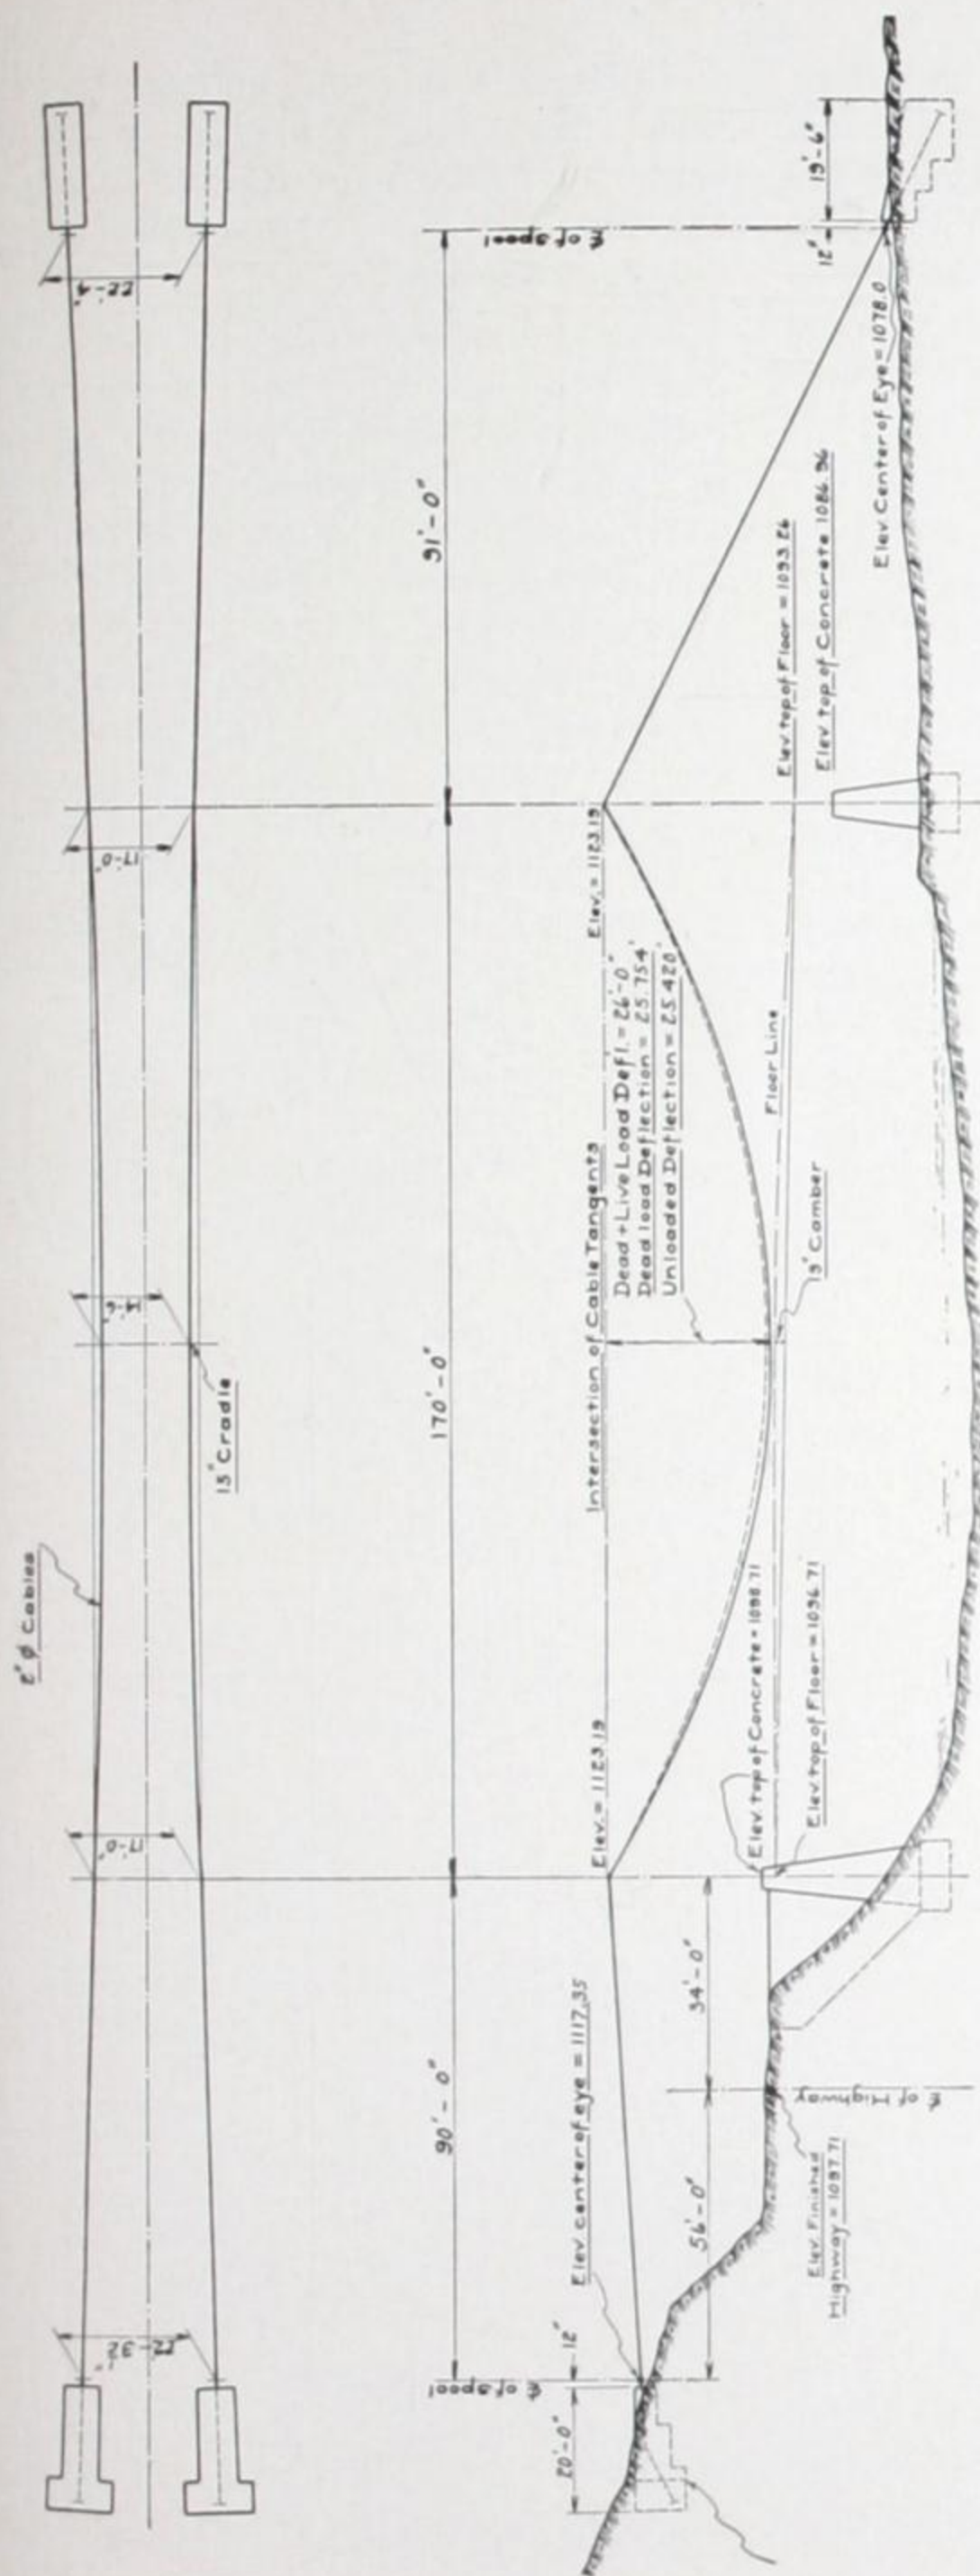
Working drawing giving principal dimensions governing cable erection and adjustment
